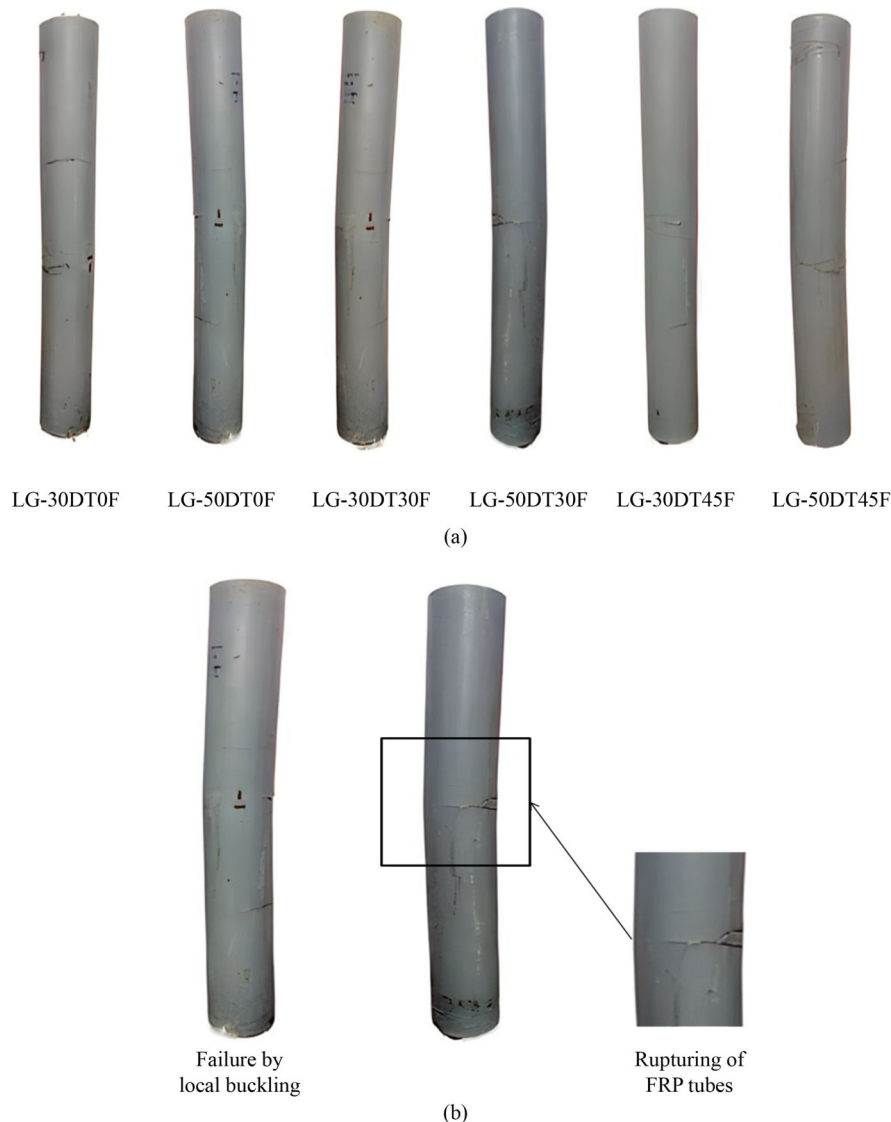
(a) LWSCGC-GFRP columns after failure; (b) general failure modes of the columns.
